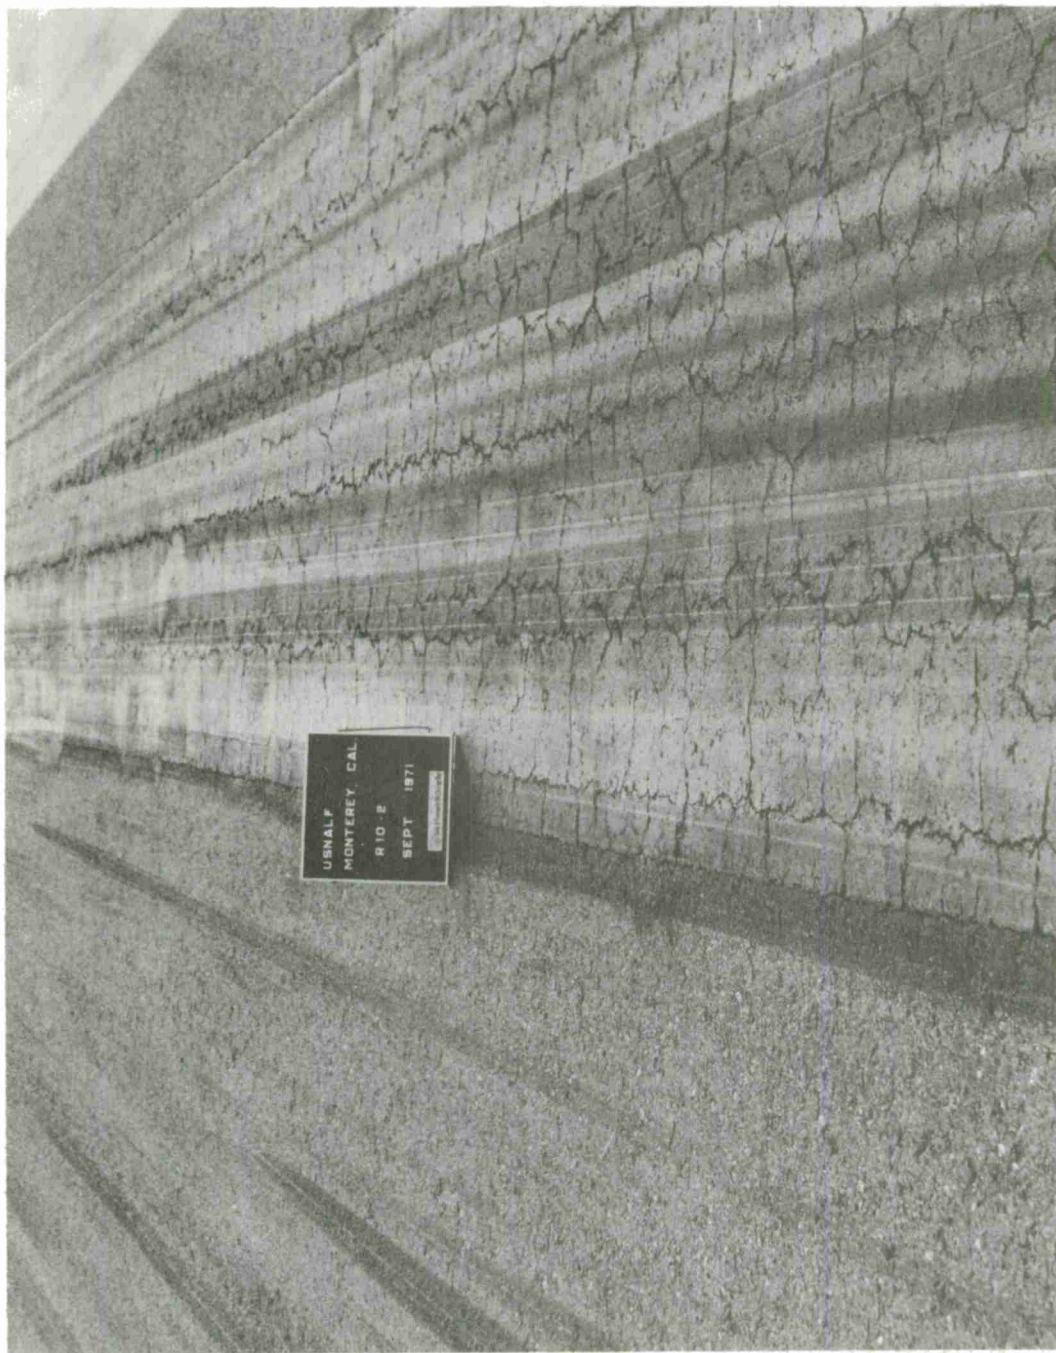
Pattern cracking under paint stripe, Discrete Area R10-2.
